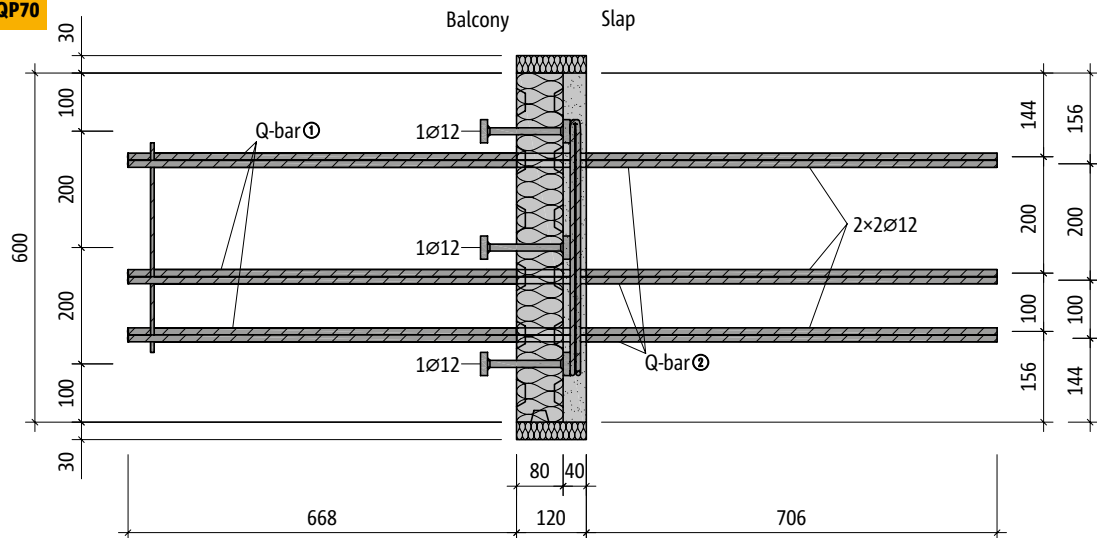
Plan view: Schöck Isokorb® type RQP70+RQP70
